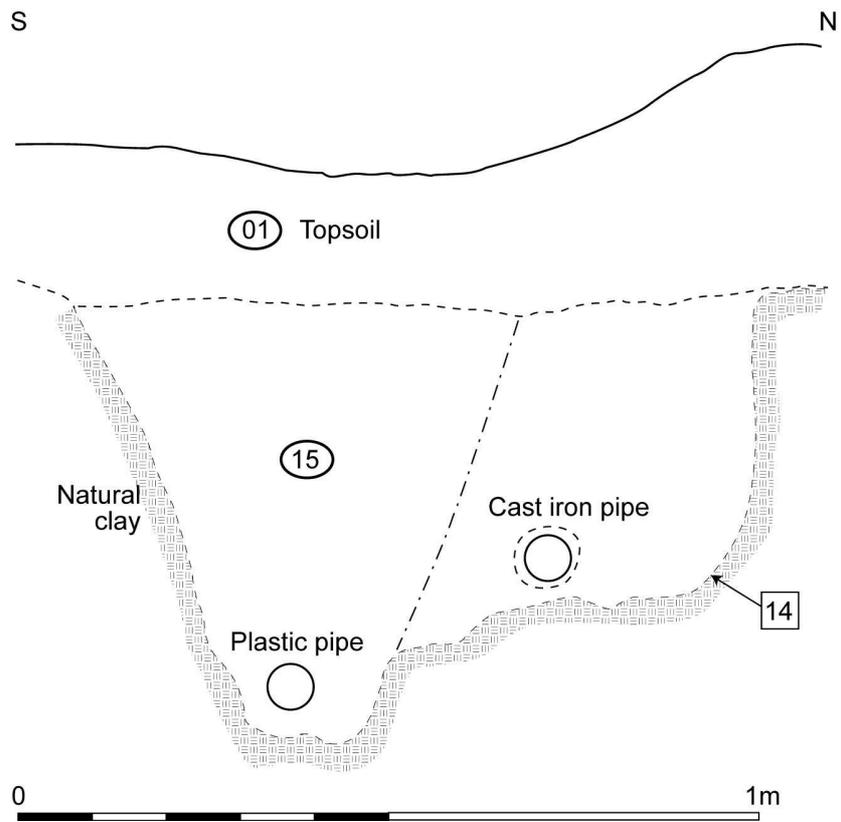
Section drawing of Water Pipe trench B14, Trench B
